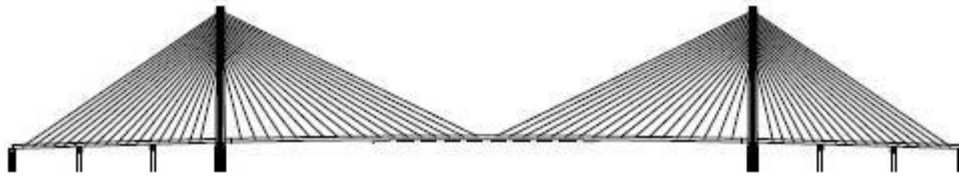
Elevation view of Yangpu Bridge in Hainan province, China
